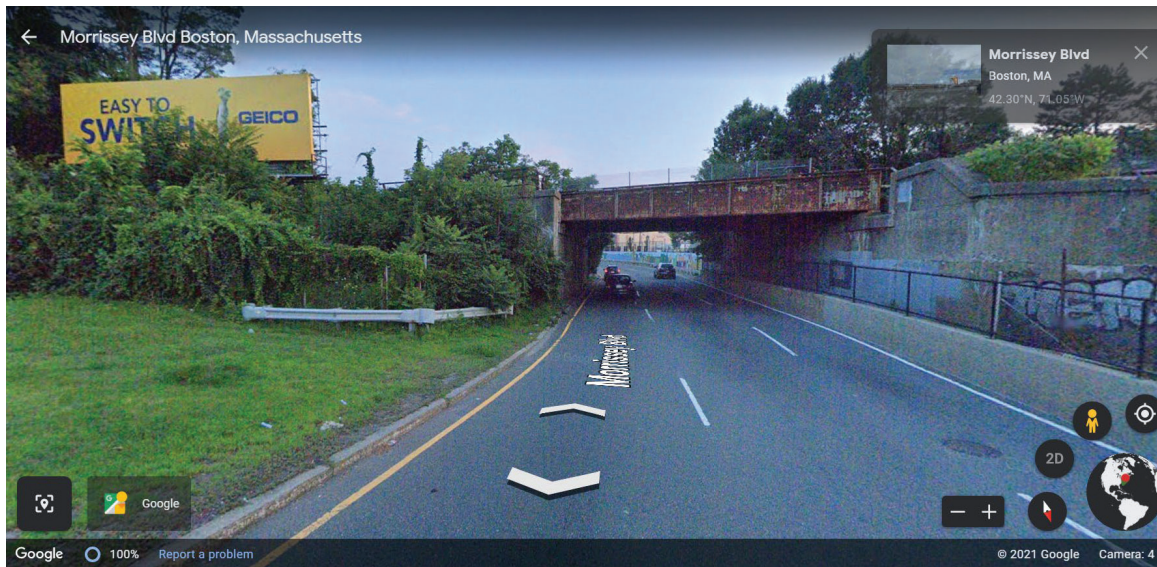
Morrissey Boulevard facing southwest toward Popes Hill Pedestrian Bridge.
